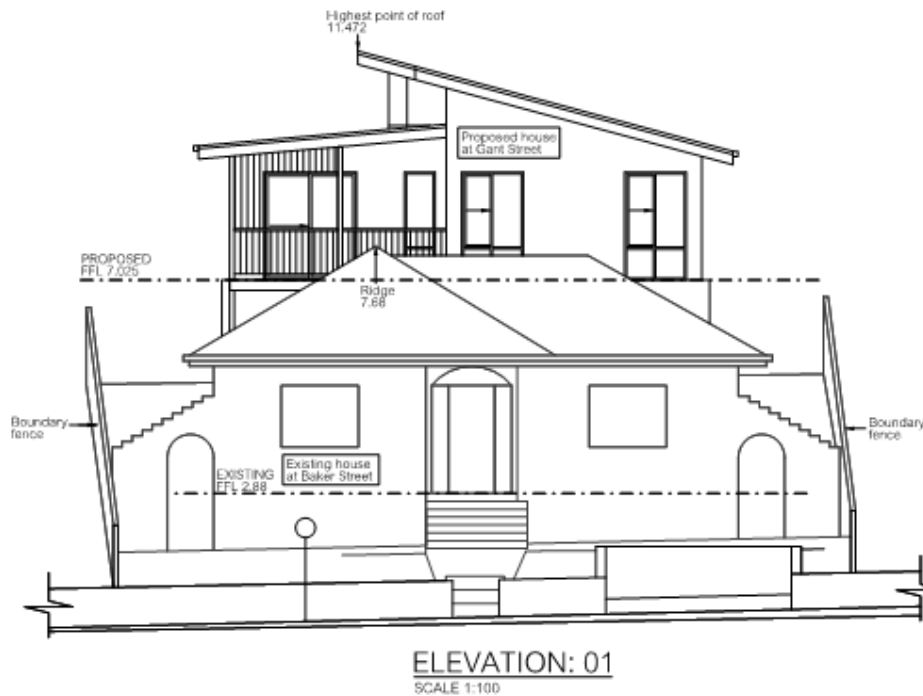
Excerpt from plan o1e/03 (submitted 5 April 2016).
